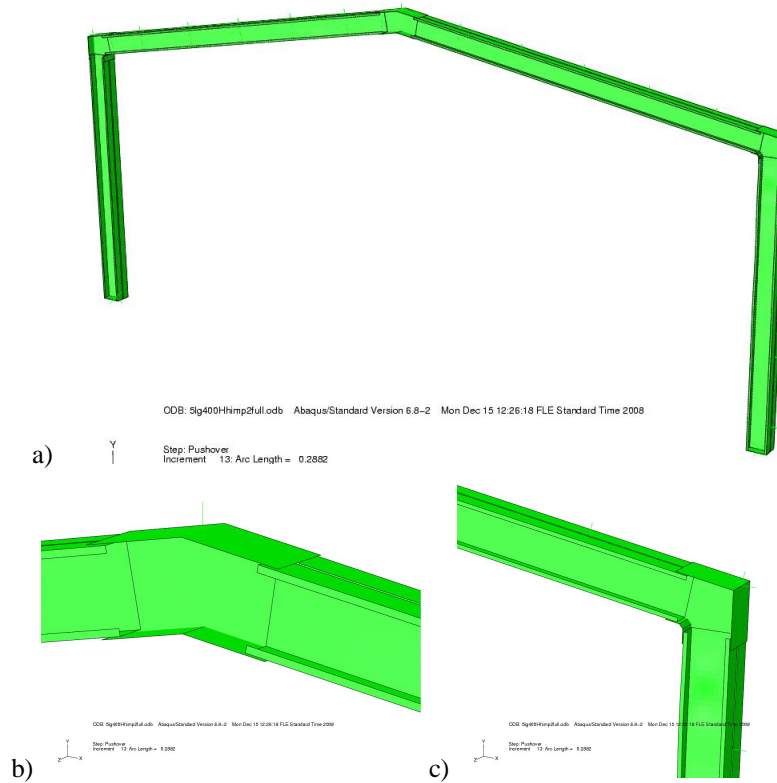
Configuration of LGS frame with back-to-back C elements and corner fixings.
